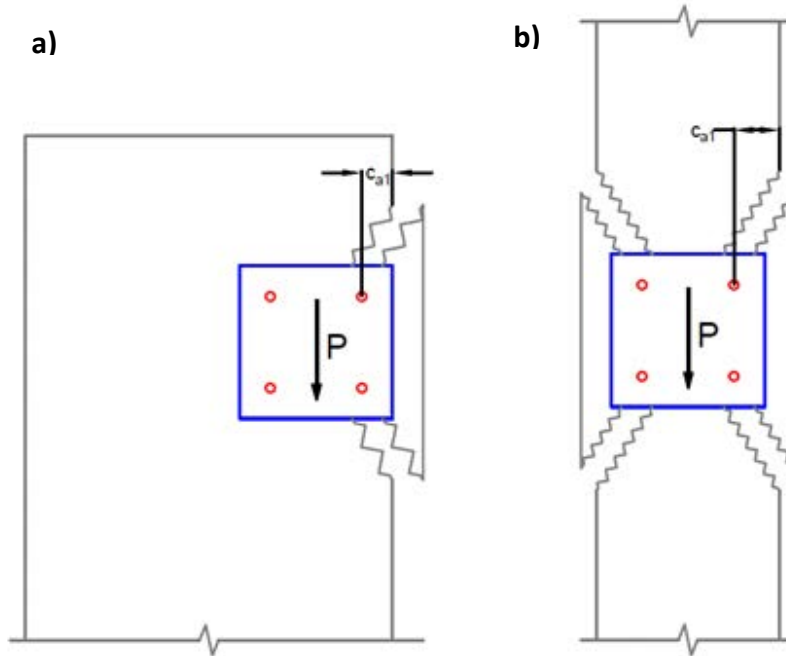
Assumed ultimate concrete breakout surface for (a) shear Case B and (b) shear Case C
